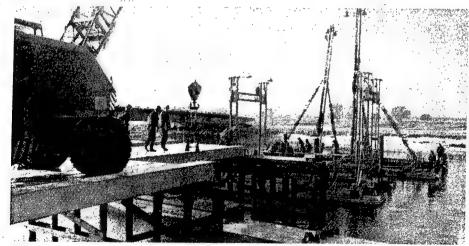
Low-Water Bridge SBG 66 With Pile Piers
